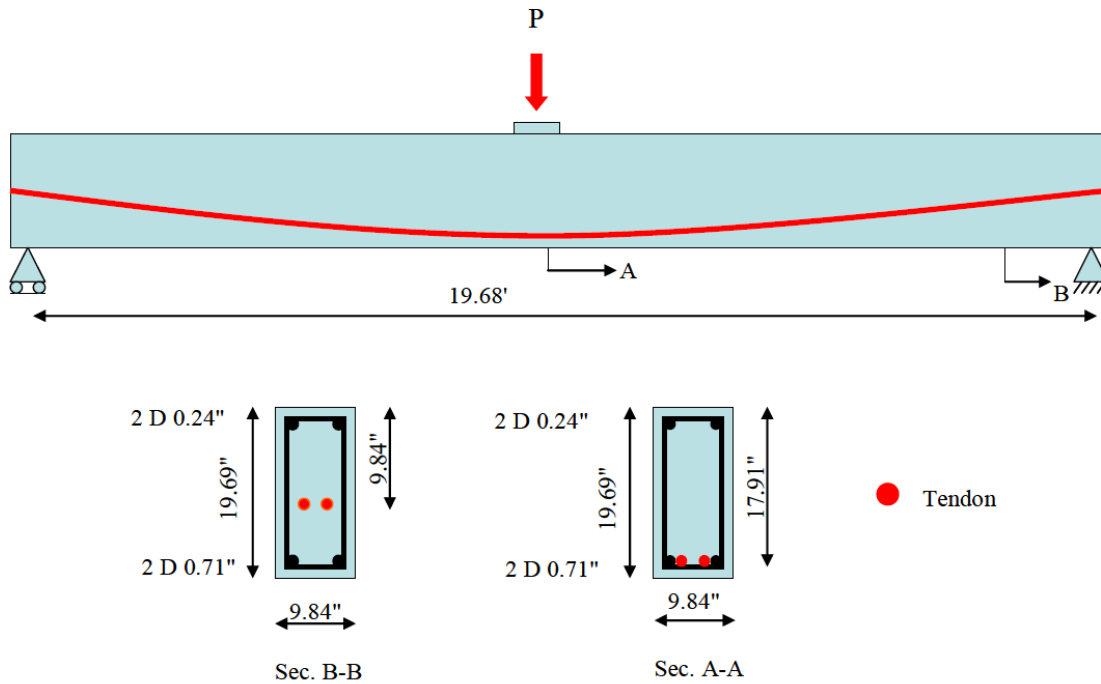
Pre-Stressed Reinforced Concrete Girder
